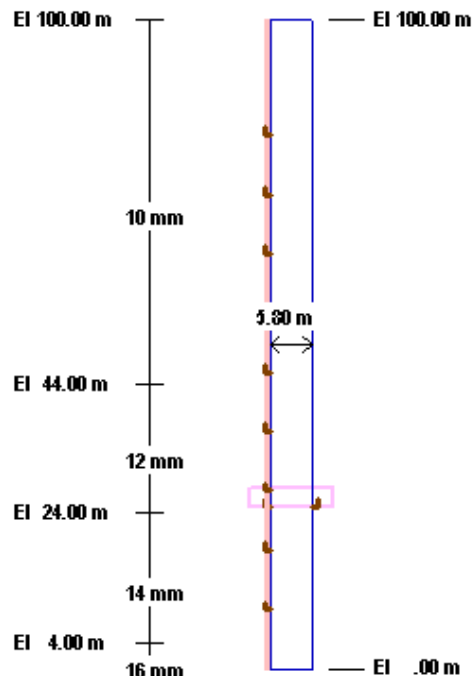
sketch of a 100 m steel stack under construction in Russia
